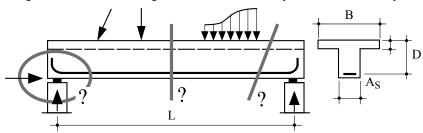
/1: Reinforced concrete beam and three failure possibilities
